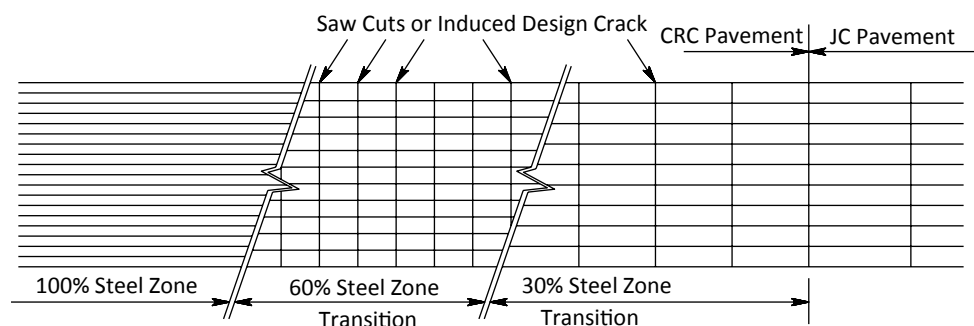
Gradual transition from continuously reinforced to jointed pavement.
